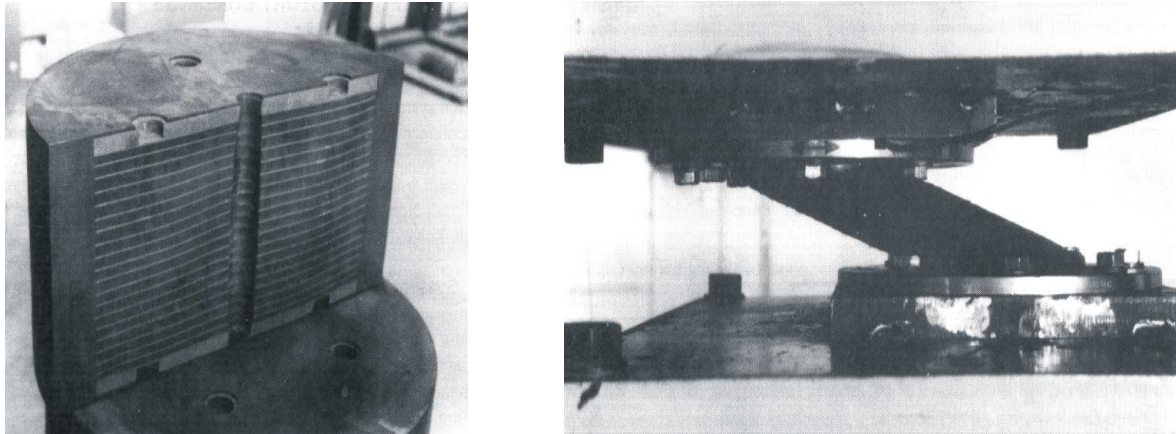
base isolation a) cross section of a laminated rubber bearing b) deformed laminated rubber bearing [24]
